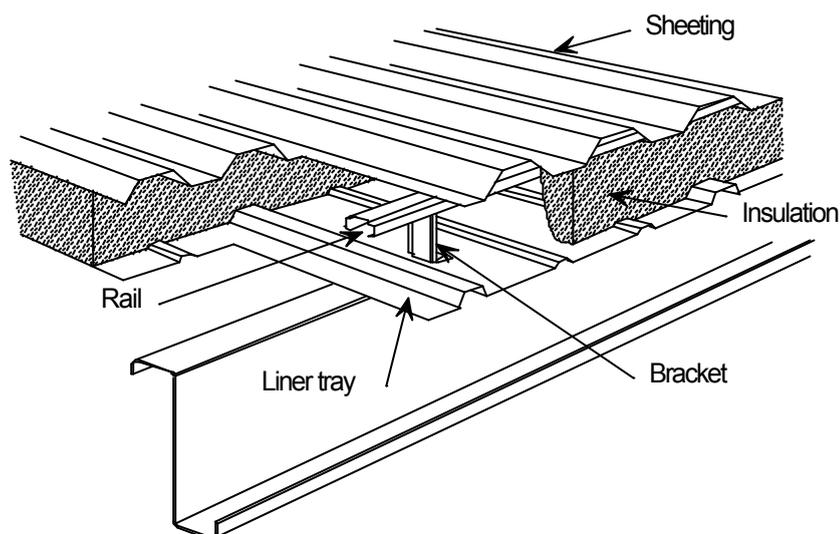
Double-skin construction using 'rail and bracket' spacers
